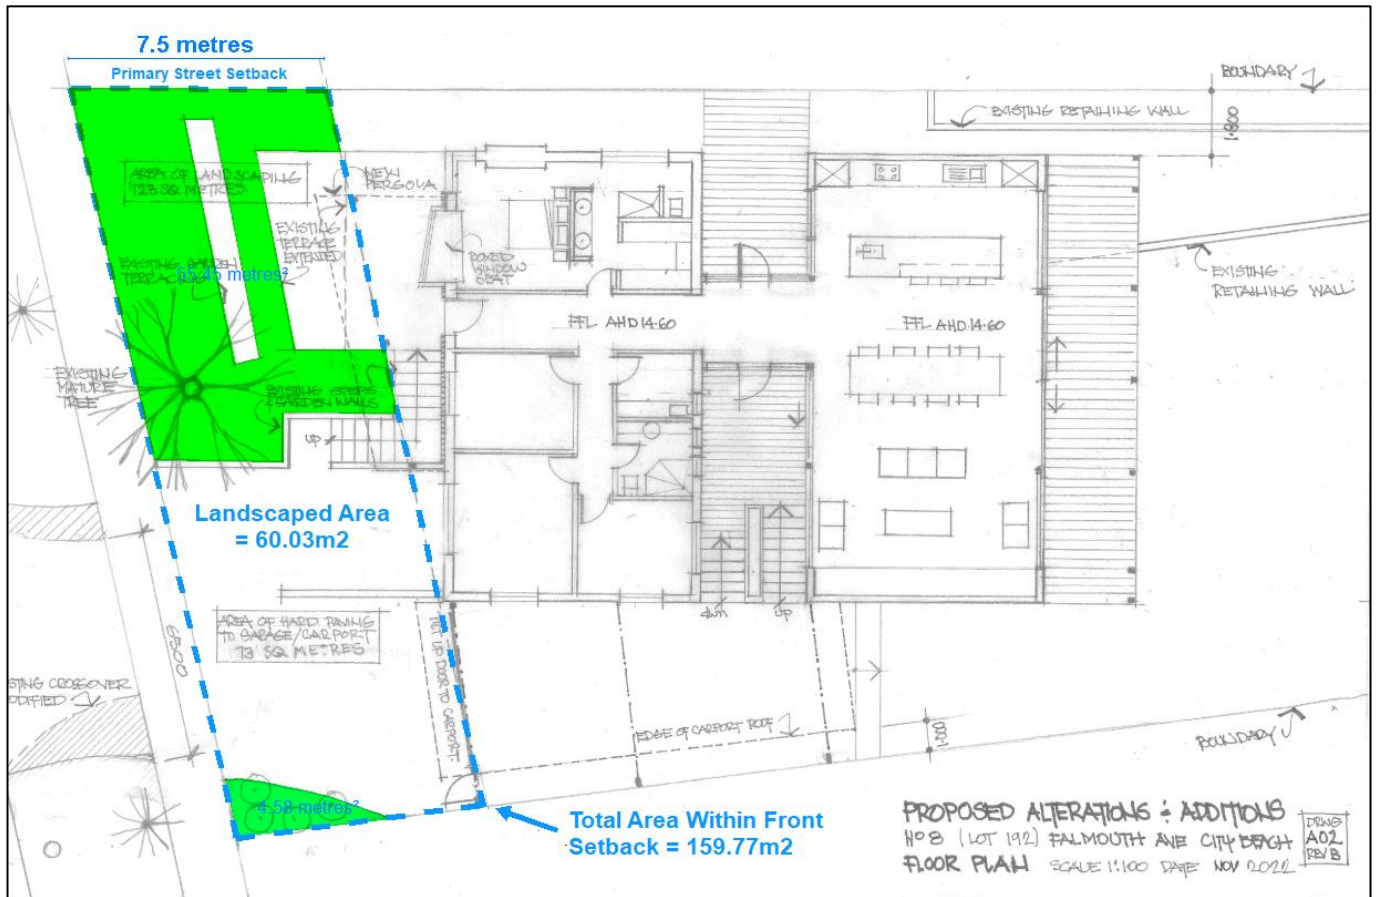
Marked-up floor plan showing the proposed areas of landscaping within the street setback area.
